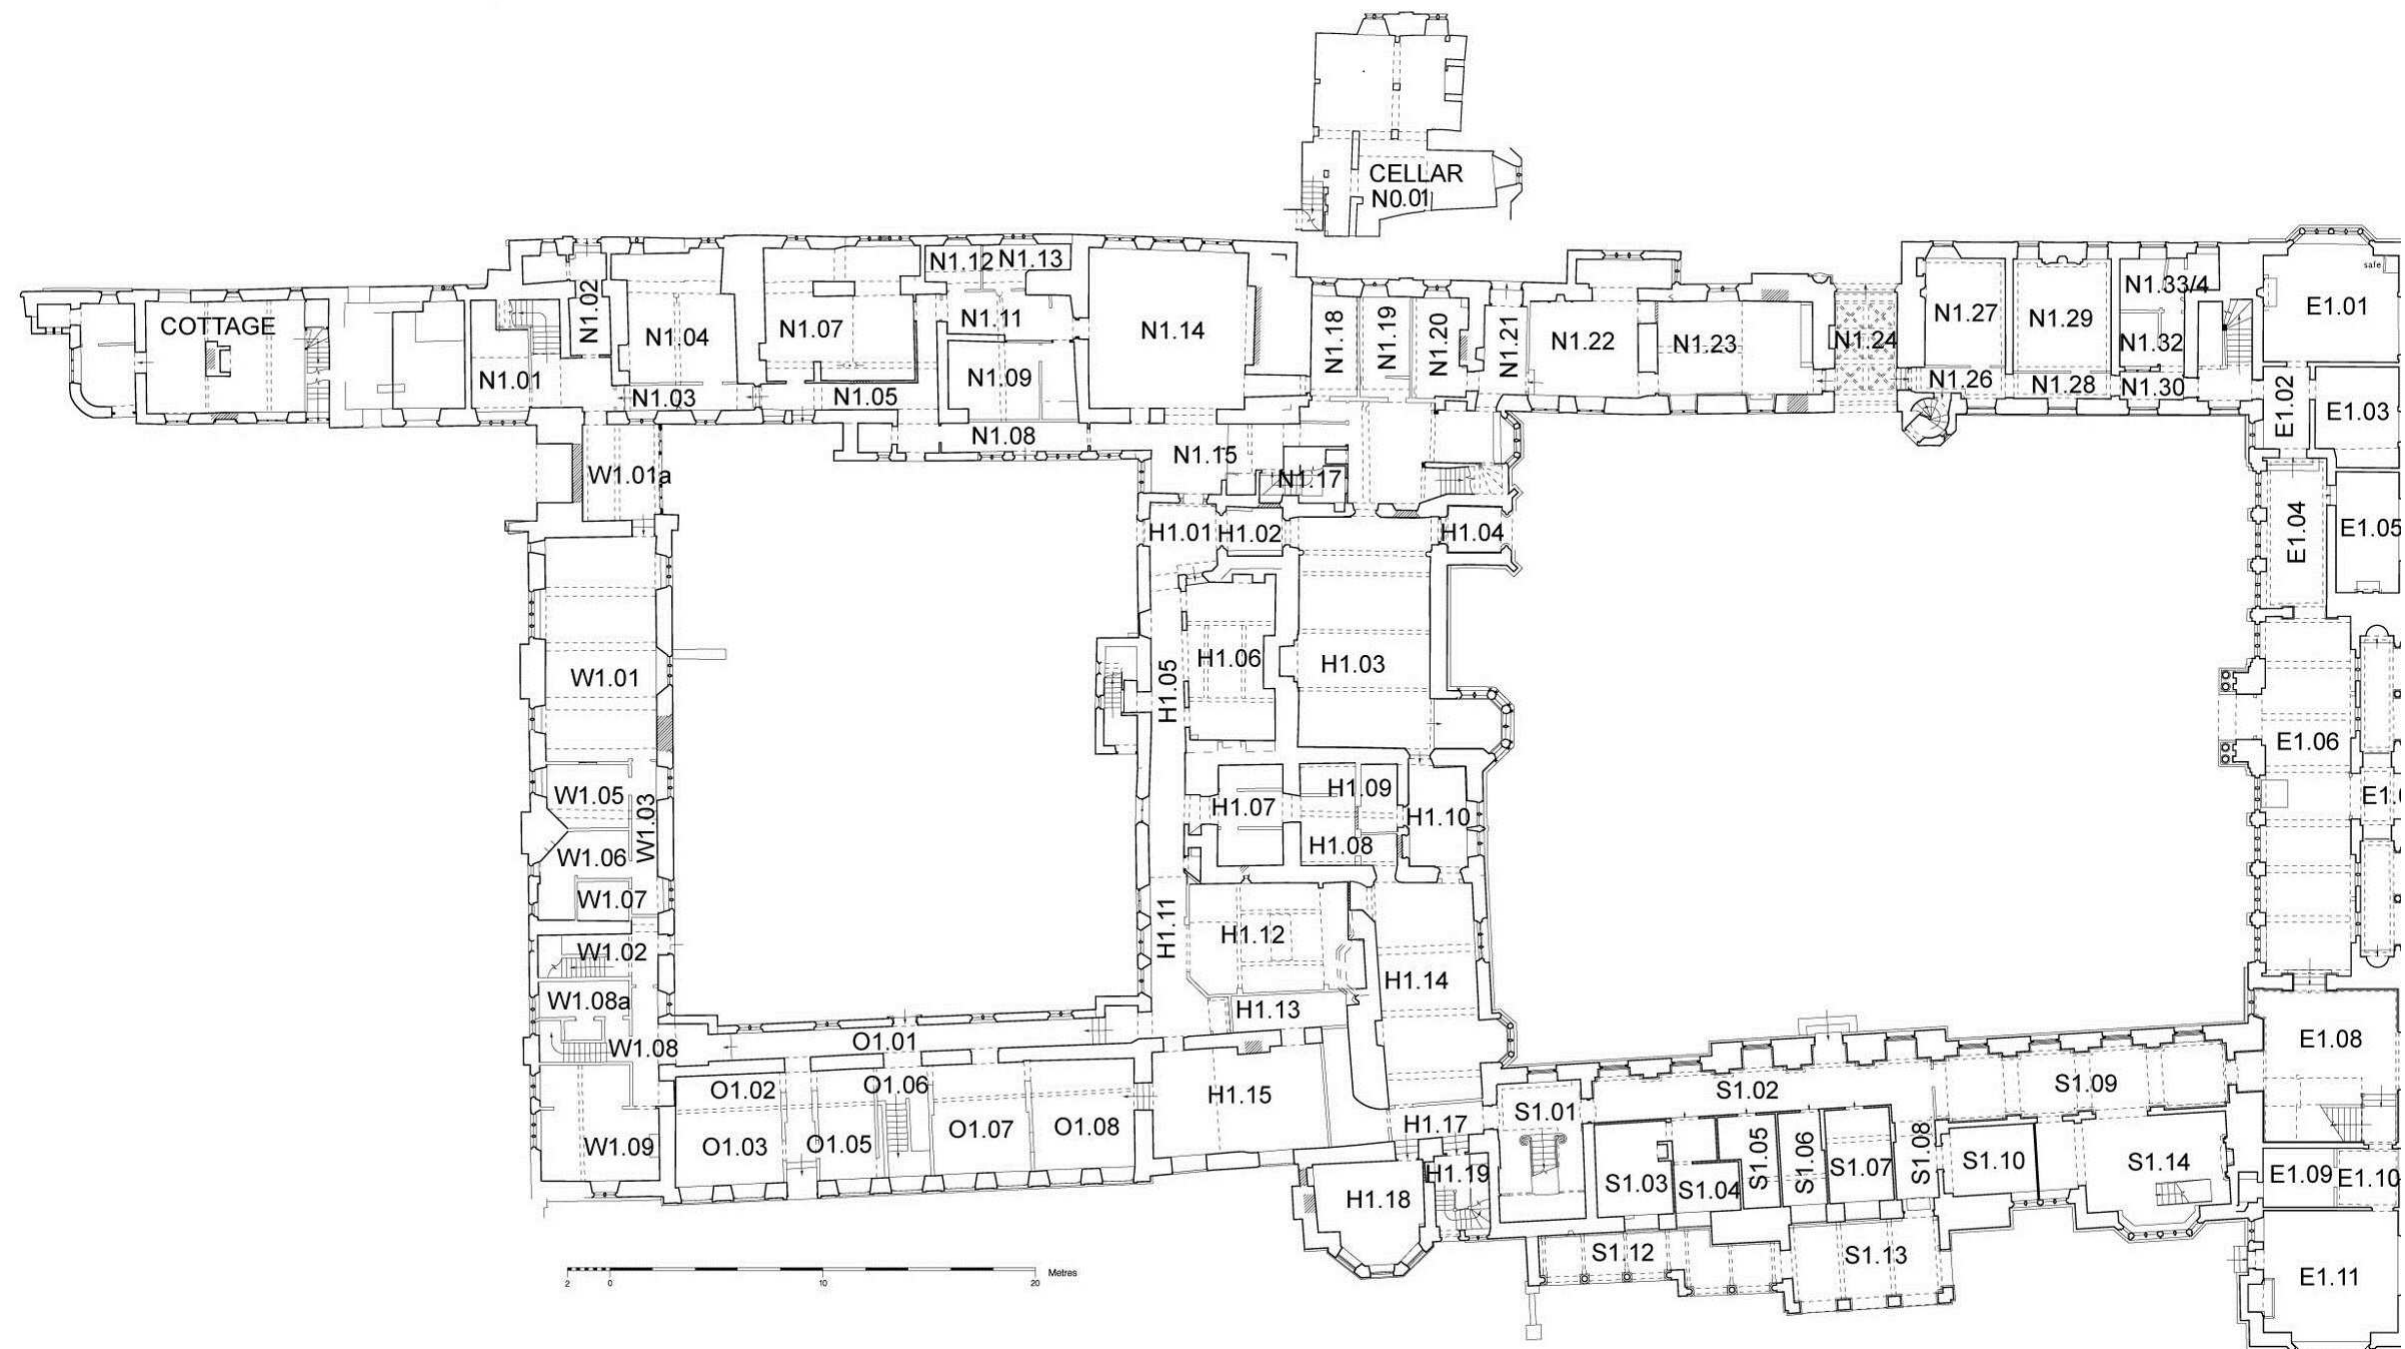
Ground floor of Apethorpe Hall, showing room numbers. E - east range; H - hall range; N - north range; O - Orangery; S - south range; W - west range
